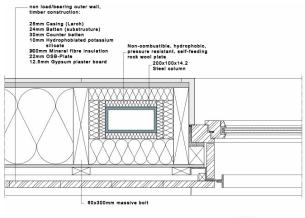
h – Detail outer wall; Dimensions in [mm]
